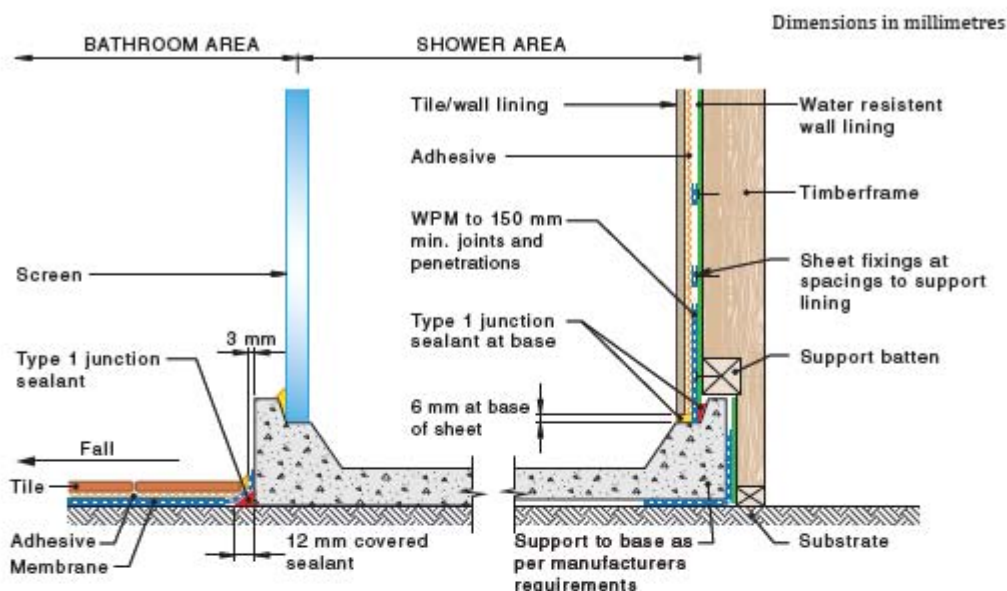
(A) — Section through stud wall with self-supporting prefinished wall panels and preformed or cast shower bases
